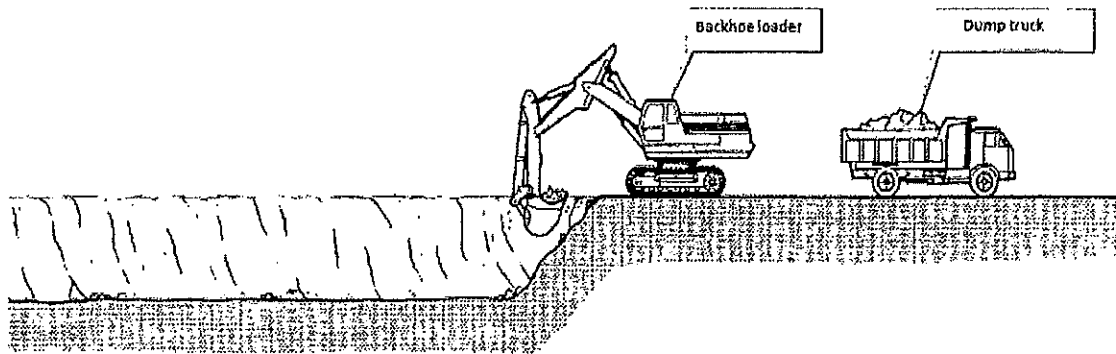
Illustration execution of Mechanical excavation of trenches constructive process
